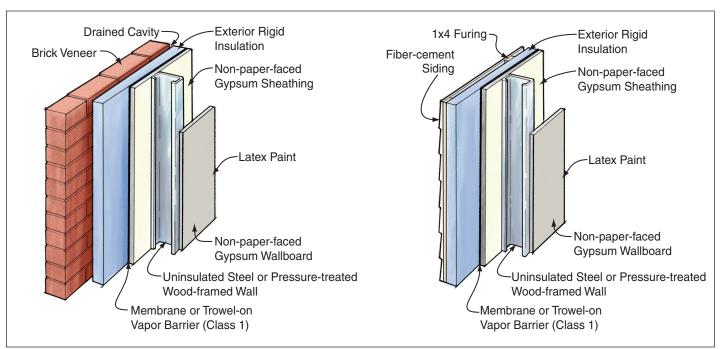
Recommended flood-resistant exterior cavity wall construction. The following materials and methods will limit flood damage to exterior cavity walls: 1) use brick veneer or fiber-cement siding, with non-paper-faced gypsum sheathing (vinyl siding is also flood-resistant but is less resistant to wind damage); 2) provide cavity for drainage; 3) use rigid, closed-cell insulation; 4) use steel or pressure-treated wood studs and framing; and 5) use non-paper-faced gypsum wallboard painted with latex paint (Source: Coastal Contractor Magazine and Building Science Corporation).
